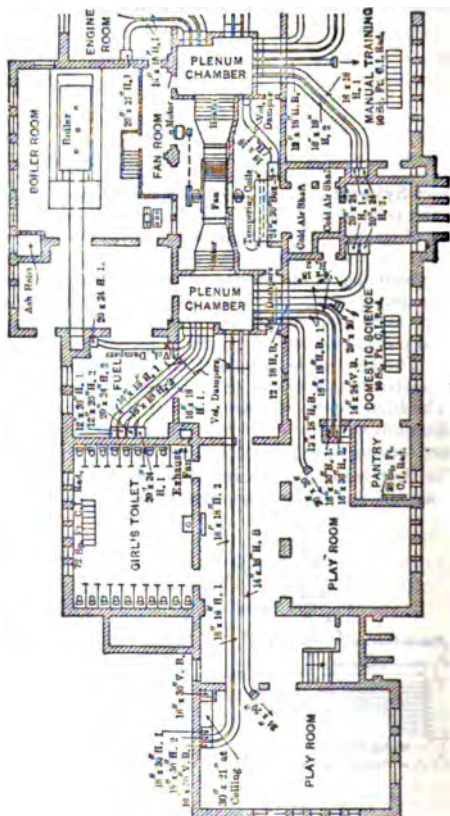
Part of basement-layout for a Single-duct System for a School-building
